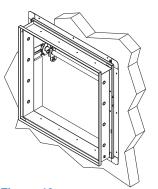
Single Flange - Flange Mount External jackshafted will not work for this installation.
